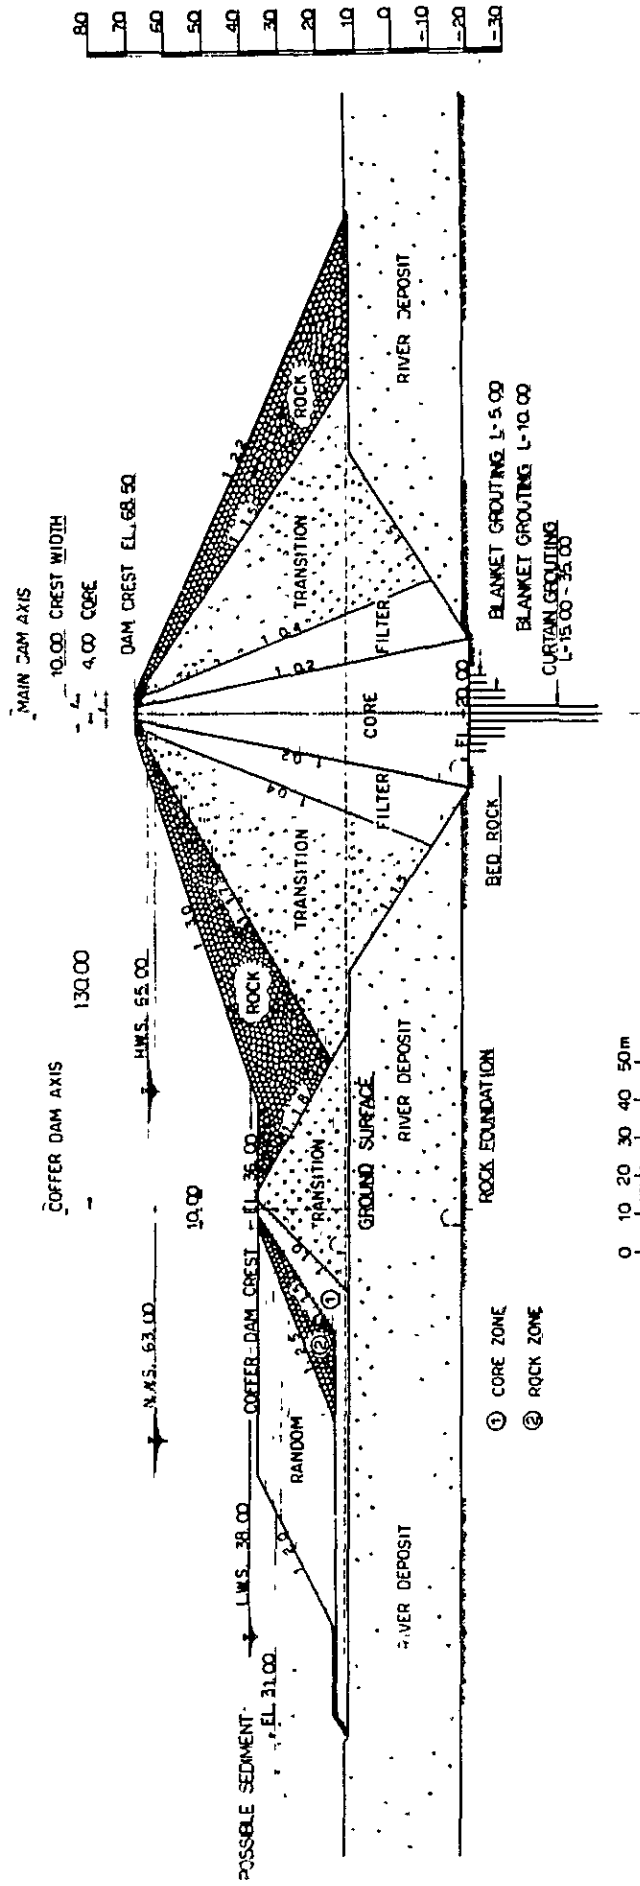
TYPICAL CROSS SECTION OF DAM (TYPE-A)
